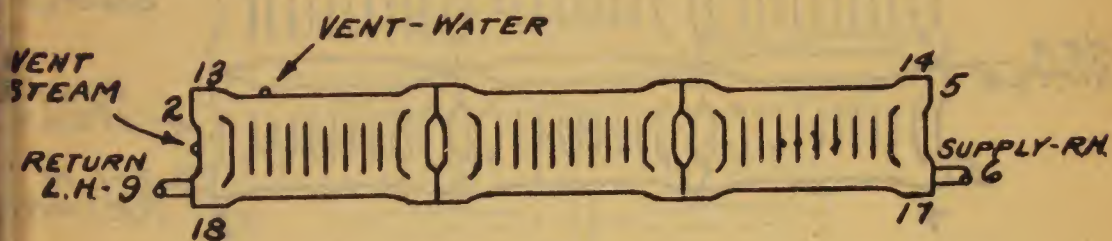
Assembled in single tier. Water or one and two pipe steam.
